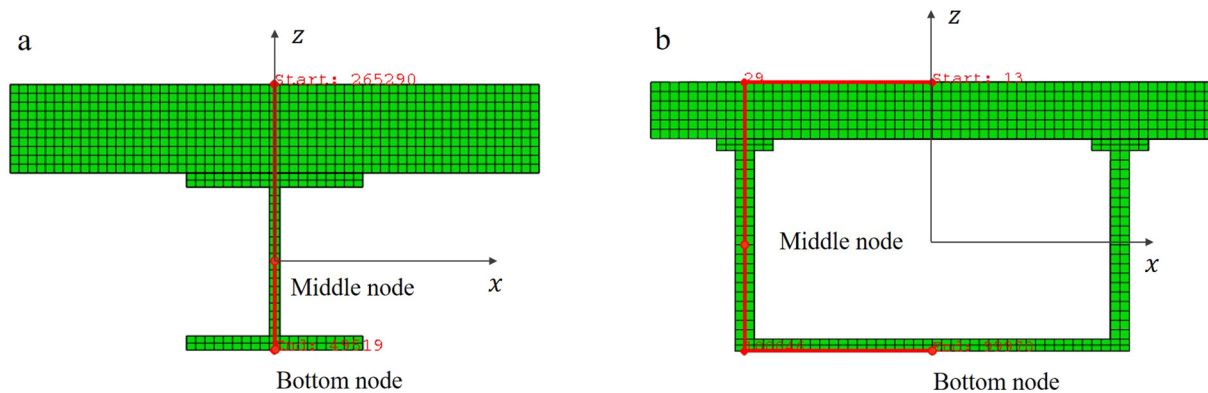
Path and nodes on cross sections. (a) I-girder; (b) Box-girder.
